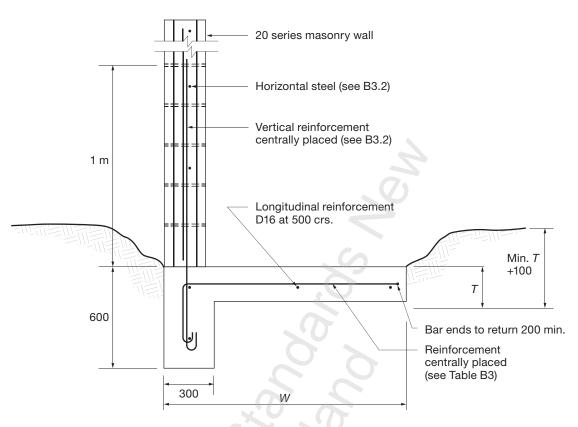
Strip footing for cantilevered walls (solid or partially filled) where footing is on one side of wall
